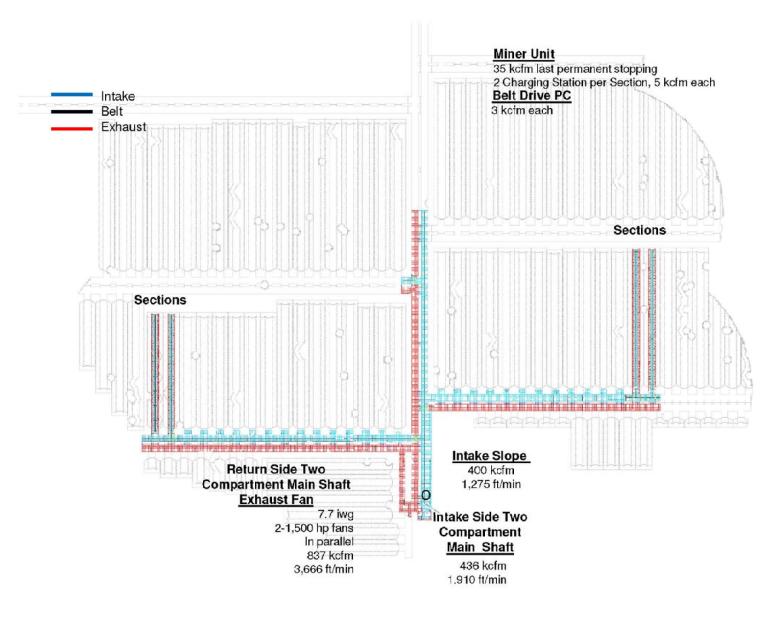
Ventilation Model for Mining Years 1 to 25
